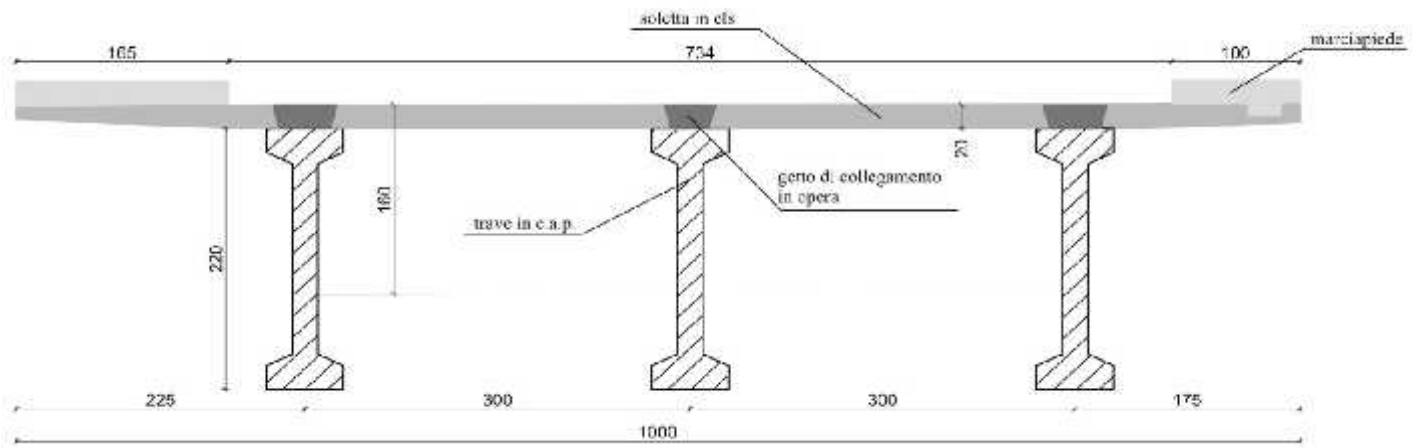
Geometric scheme of the deck/ Schema geometrico dell'impalcato
